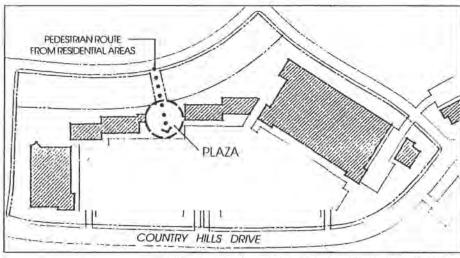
Illustrative plan, Laurel Road retail center.
